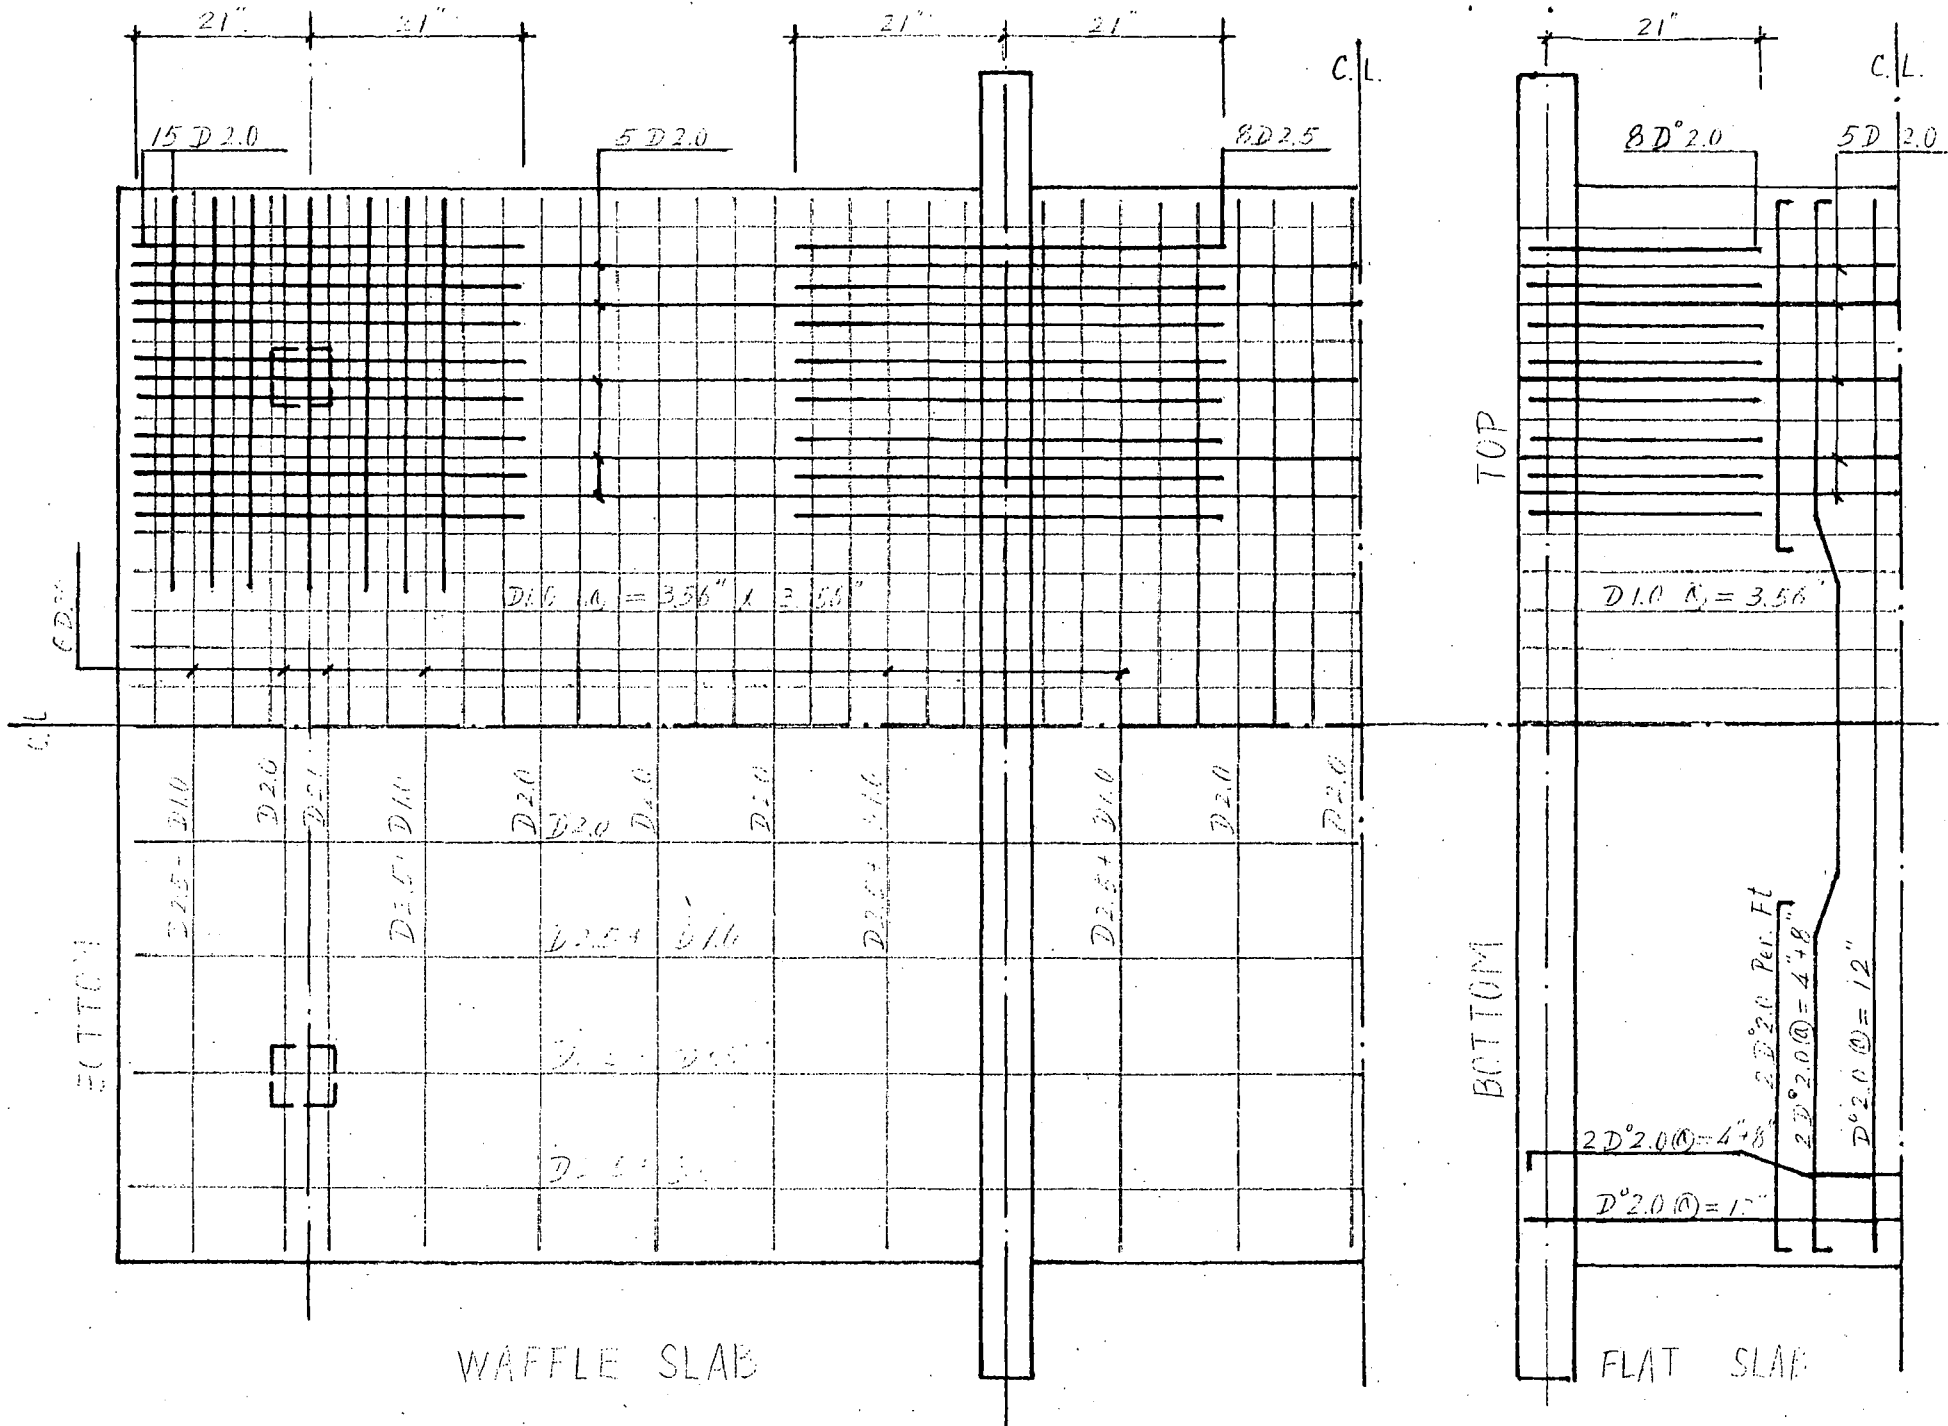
DETAILS OF THE WAFFLE SLAB SPECIMEN
